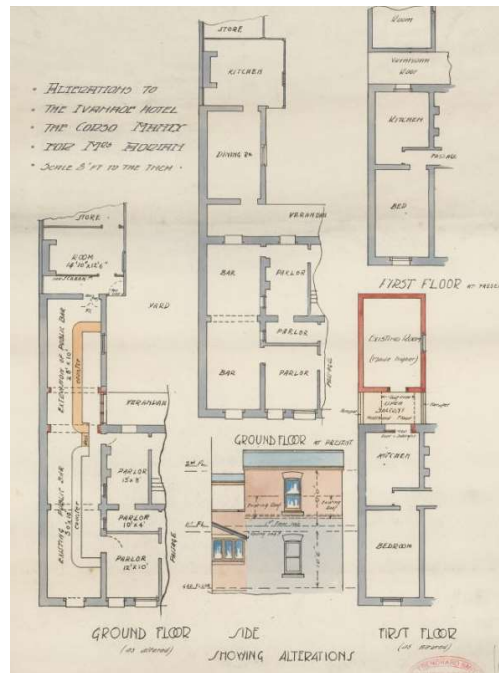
1911 - Ivanhoe Hotel, The Corso, Manly, Present and proposed ground and first floor plans, side elevation, Applicant/owner, Mrs Adrian, Architect F Trenchard Smith, Pitt Street, Manly, Signed 25 May 1911. (Source: NSW State Records and Archives, Digital ID 9590_62825)
